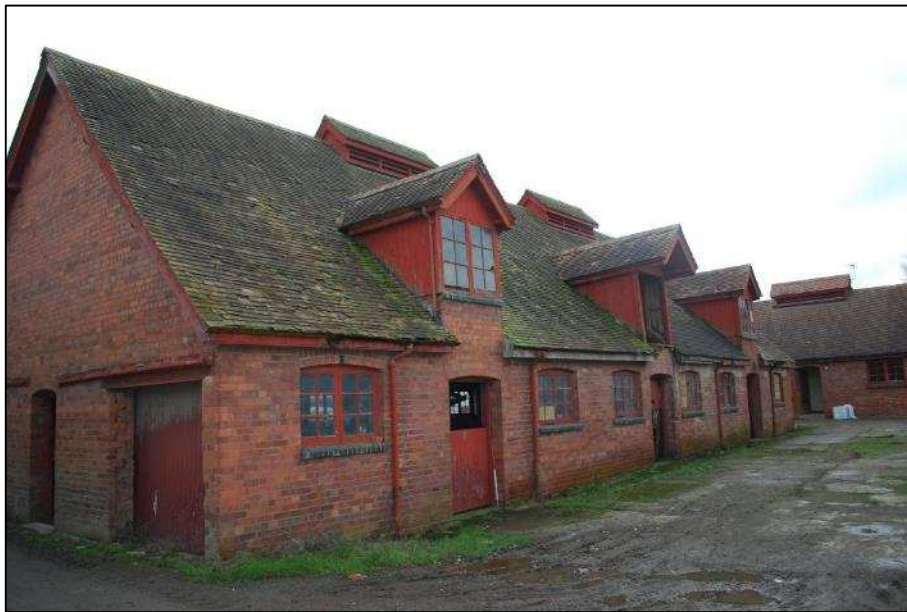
(Shot 15): North facing elevation of Building C, looking southwest
